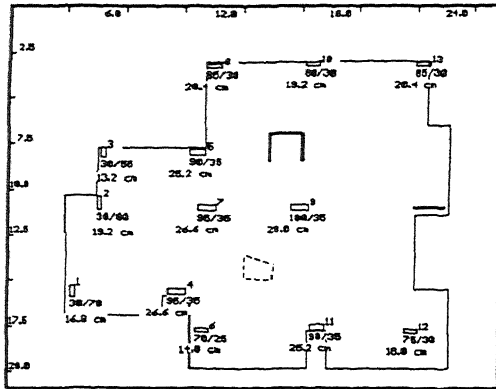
ERDES results: Column sizes, reinforcement (3rd floor of 8-story building)
